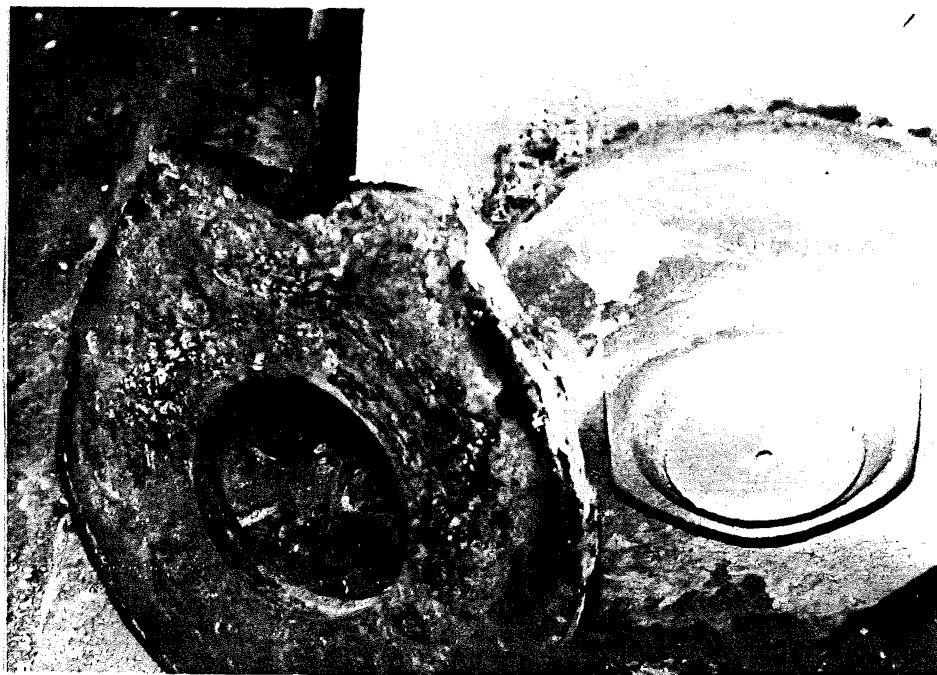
View of Corrosion Notch at Edge of Eyebar
